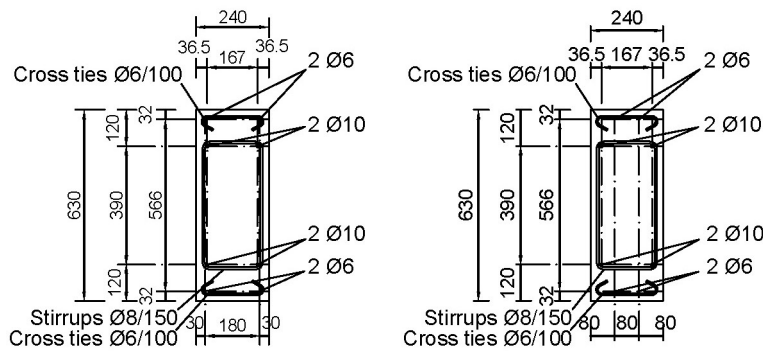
Dimensions and reinforcing details of the concrete specimen used for the tests with anchor groups located close to parallel edges. (Note: All dimensions are in mm).
